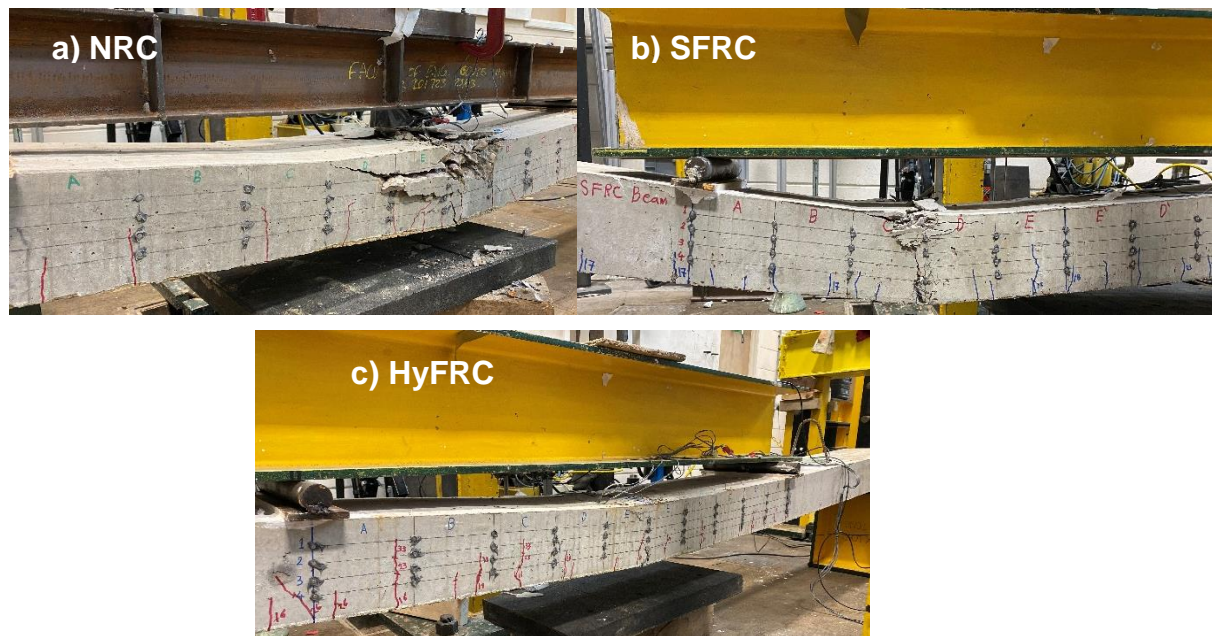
Crack pattern and mode of failure for normal and fibre-reinforced concrete beams
